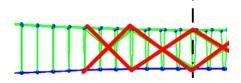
Vertical Bracing Pattern at Center of 70 m Span Footbridge
